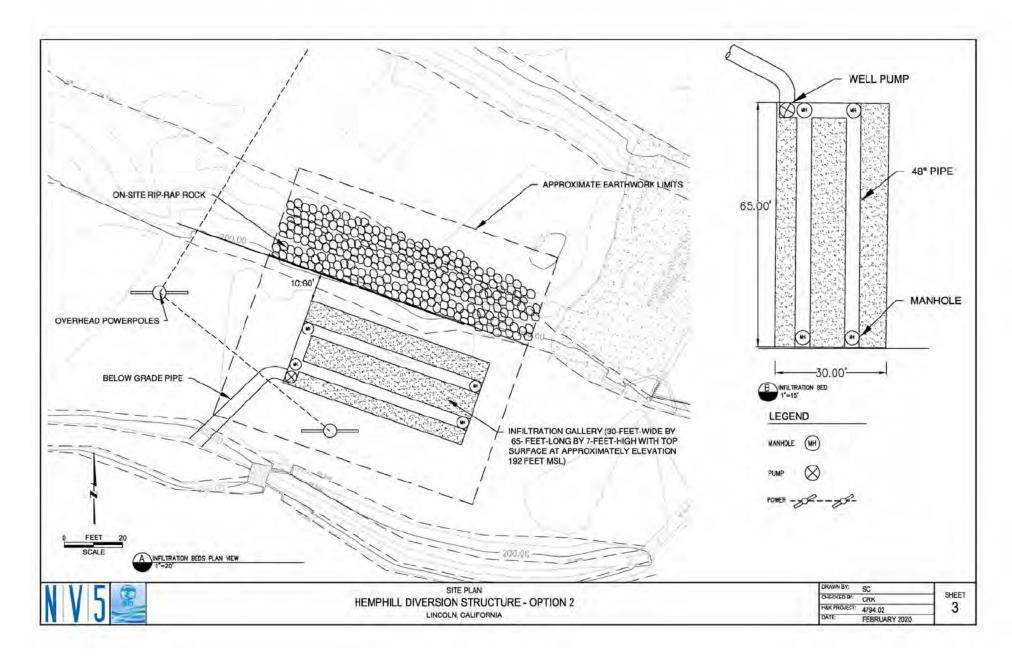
Infiltration Gallery Structure 2020-104 Hemphill Diversion Structure Project
